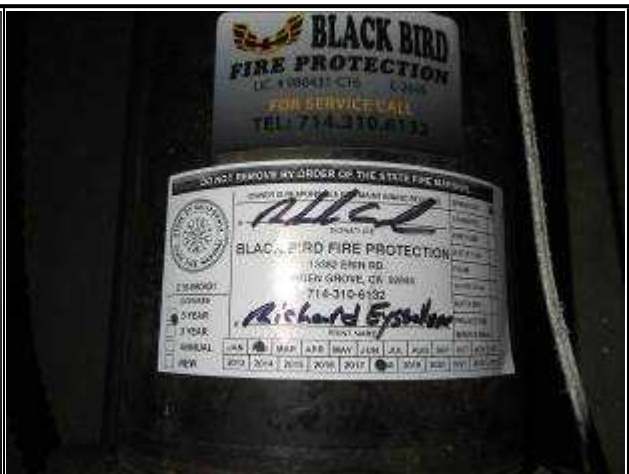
Fire sprinkler system inspection tag
